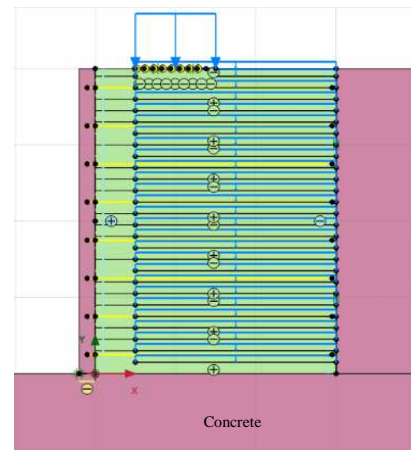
Numerical model with considering the concrete material around the backfill and for the wall face.
